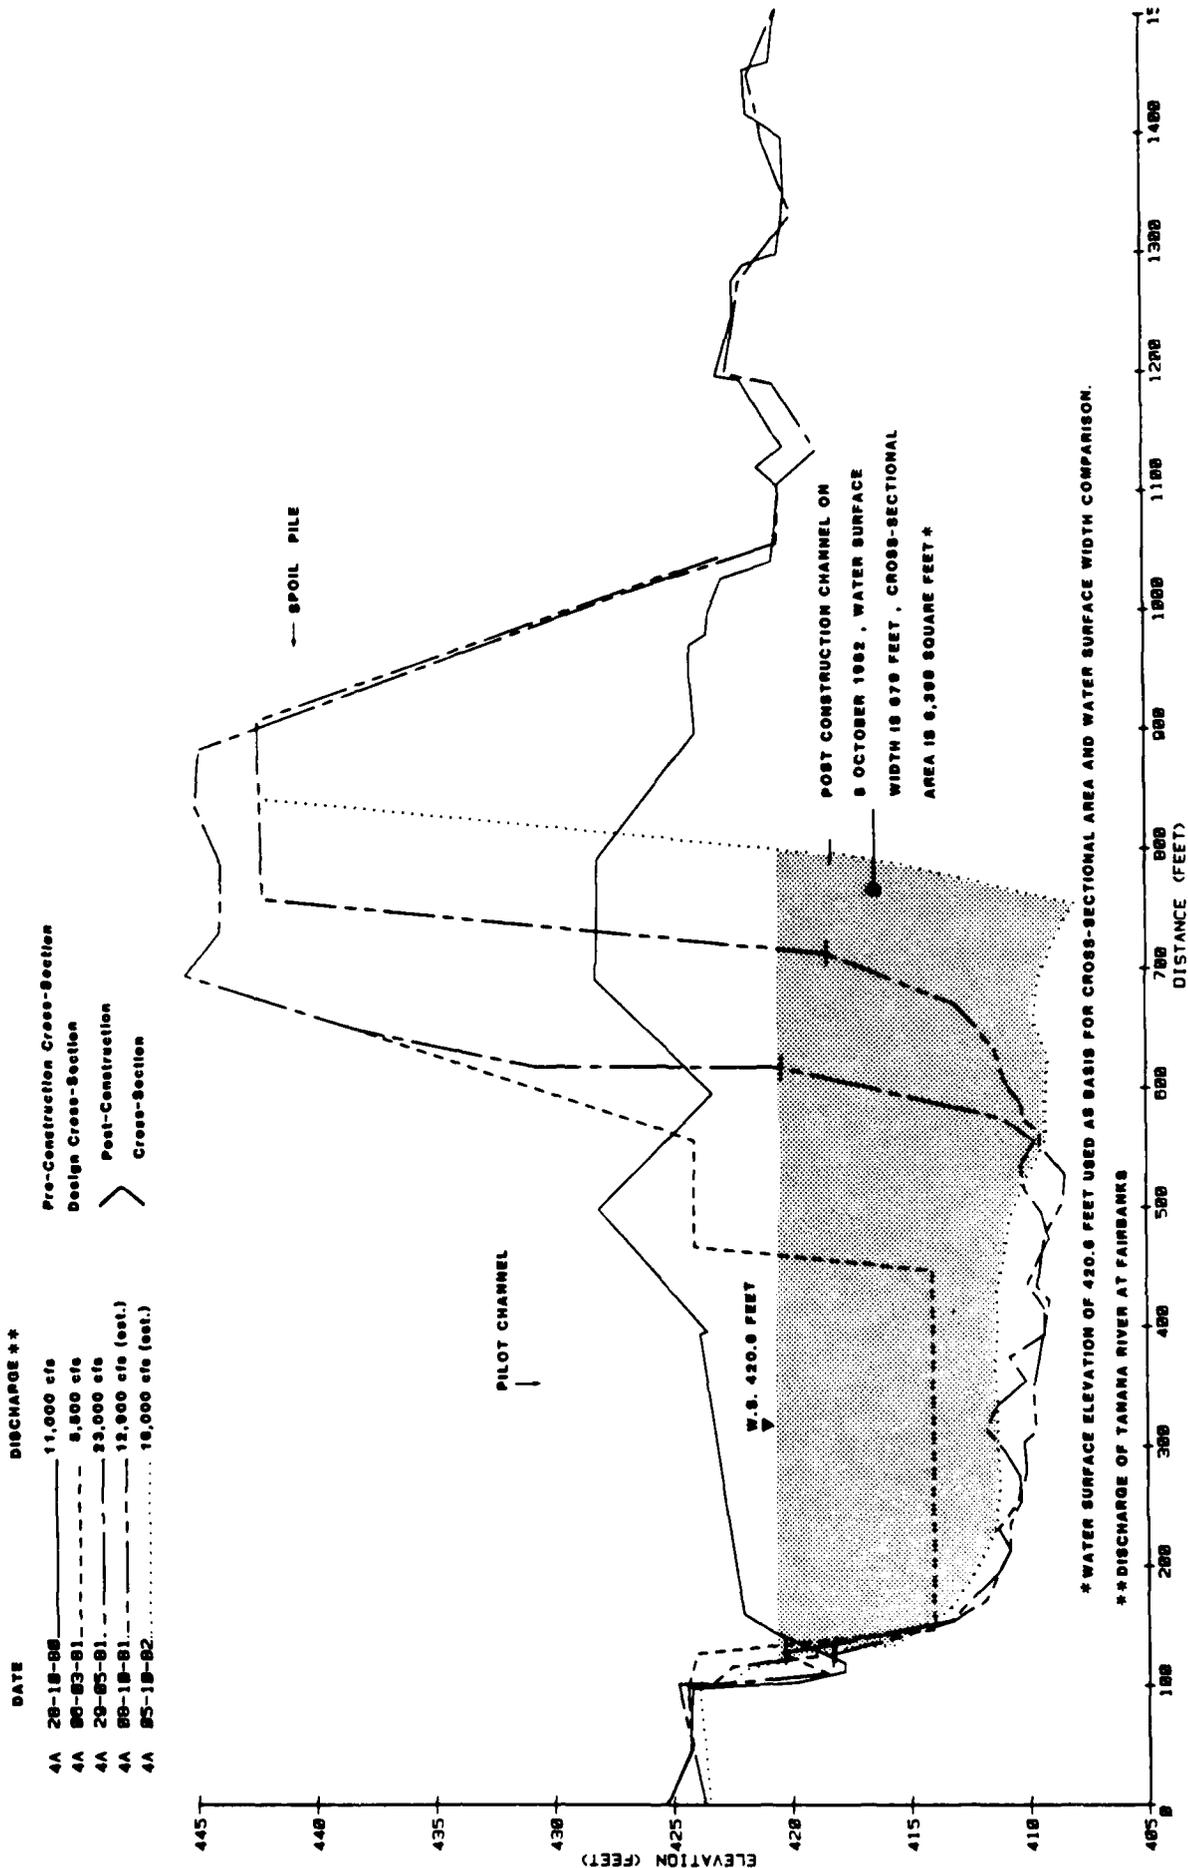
Detail of cross-sectional changes at Pilot Channel and spoil pile, cross section 4A.
